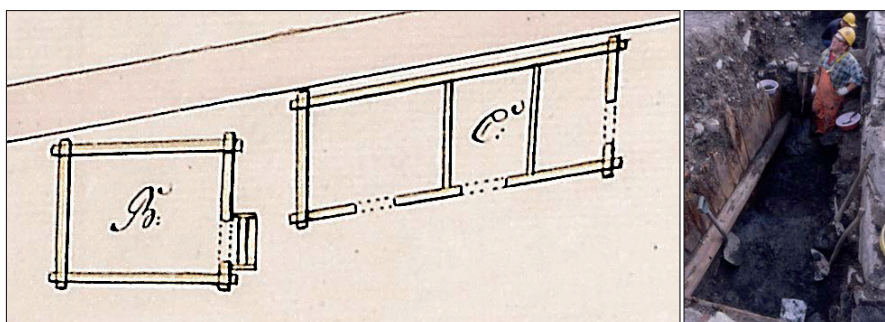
Left: Detail from Eckleff's plan of 1758 showing the privy shed (right) and a raised storage building/stabbur. North to bottom. Right: The wood-lined privy latrine pits during excavation.¹²⁹²
